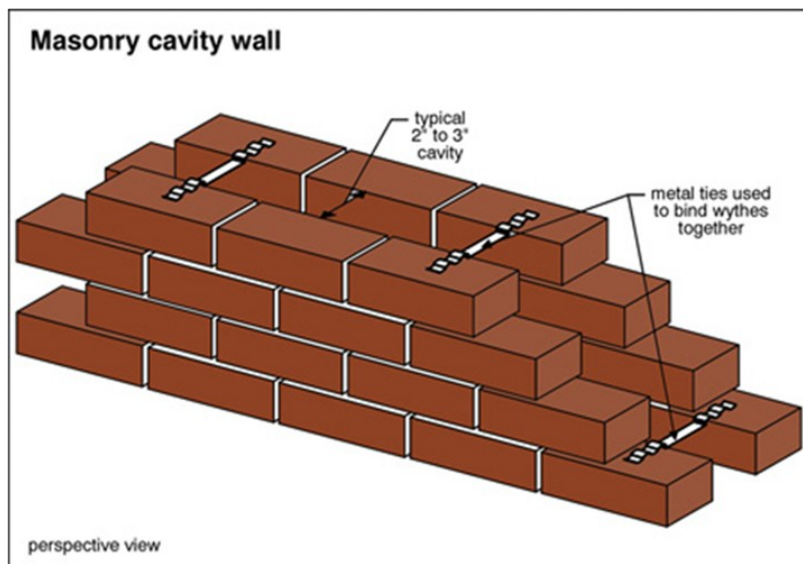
Construction process of masonry cavity wall and veneer wall (Carson Dunlop 2014)
